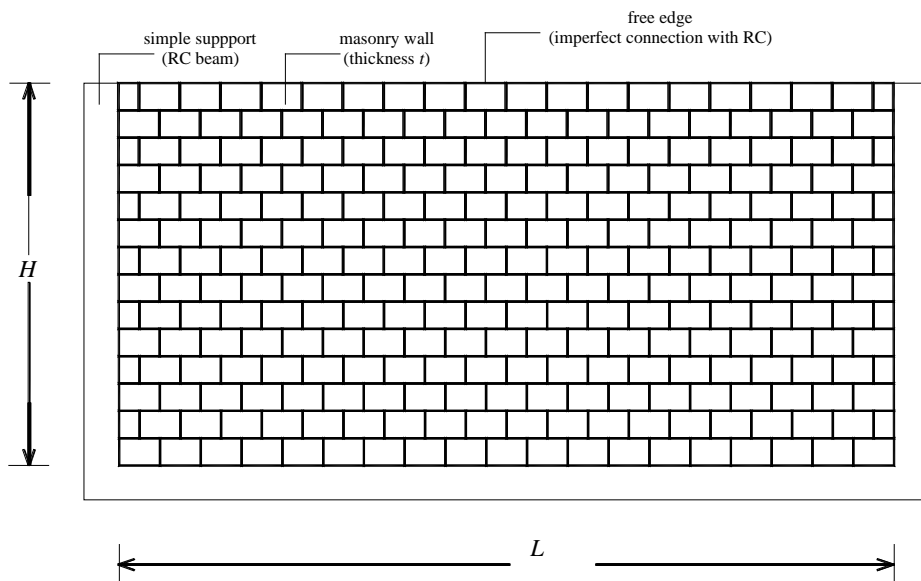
Stretcher bond masonry infill wall. Geometry and boundary constraints
